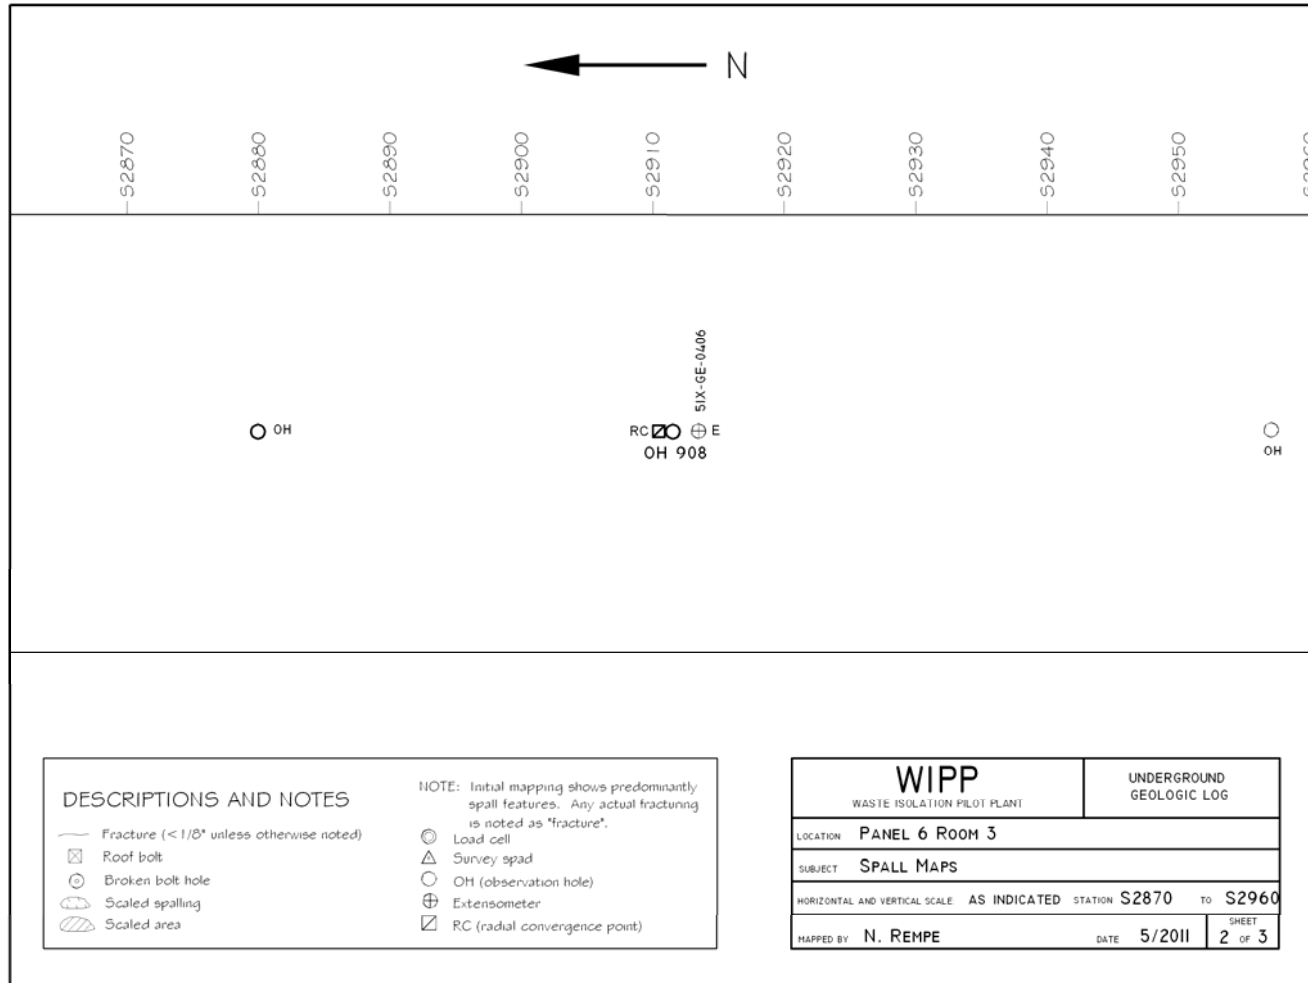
Panel 6 Room 3, S2770-S3060 Roof Fractures (Sheet 2 of 3)
